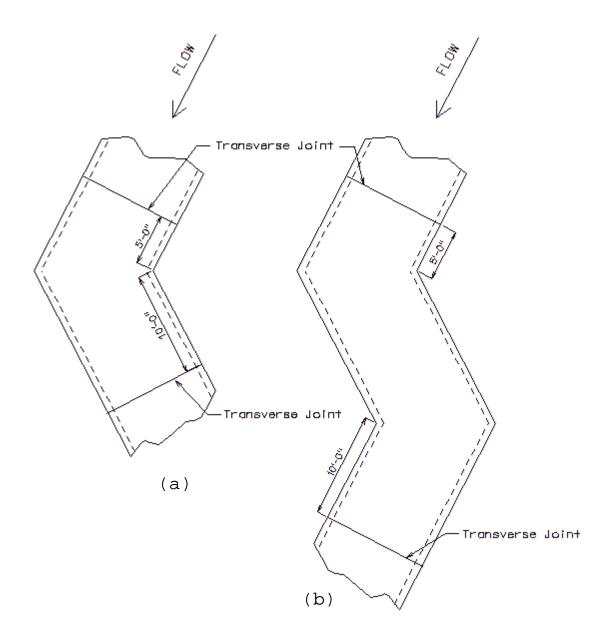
Plan view of additional sections (a) Dog-Leg (b) Broken Back
